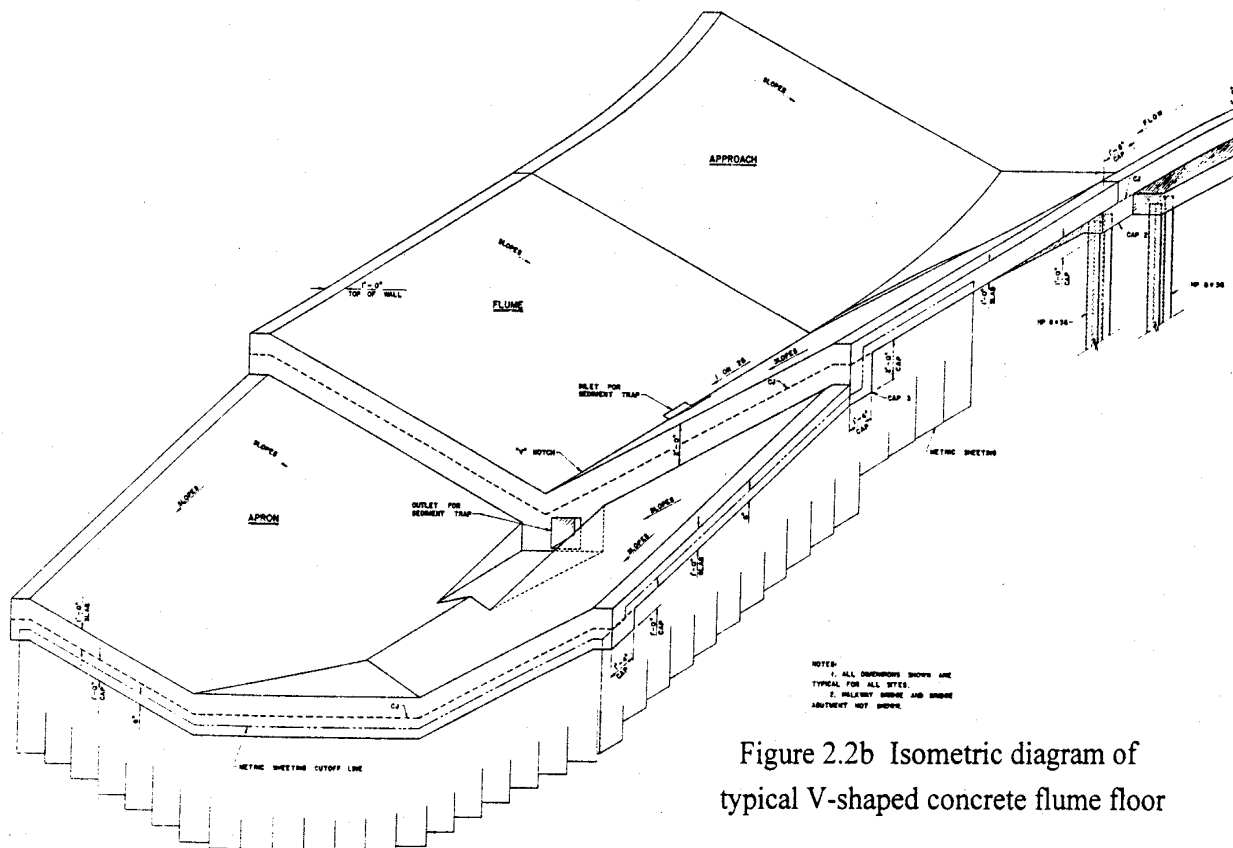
Isometric diagram of typical V-shaped concrete flume floor
